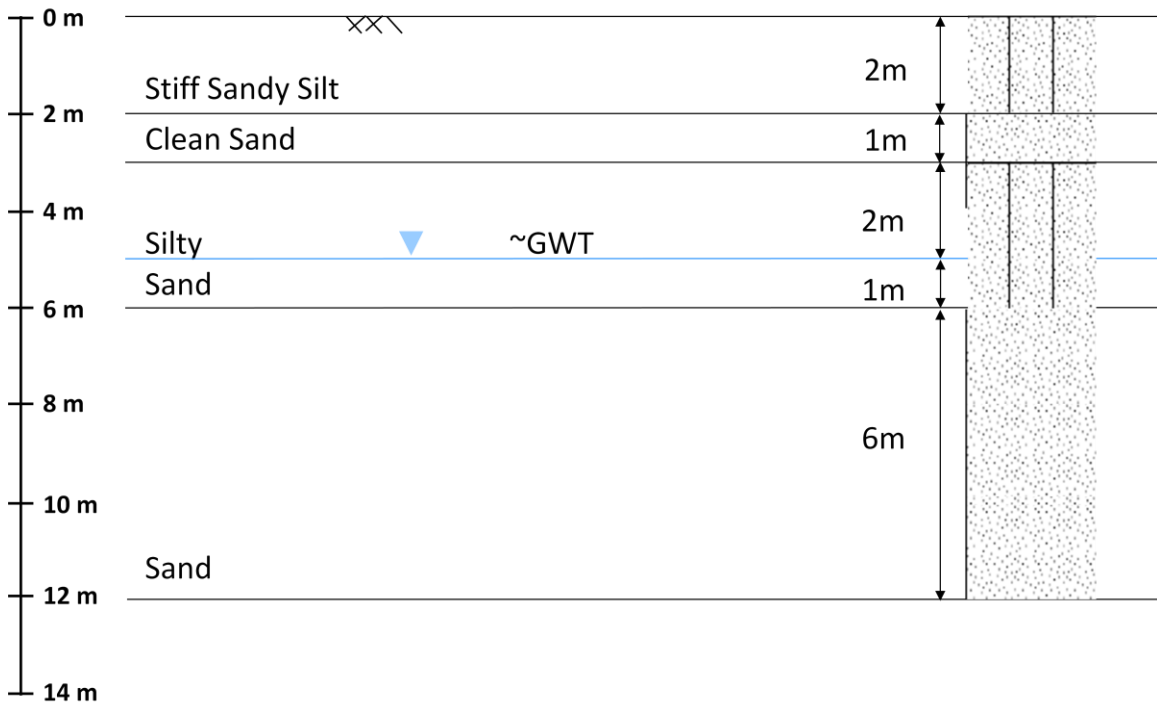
Typically soil profile at the New Madrid, MO testing site.
